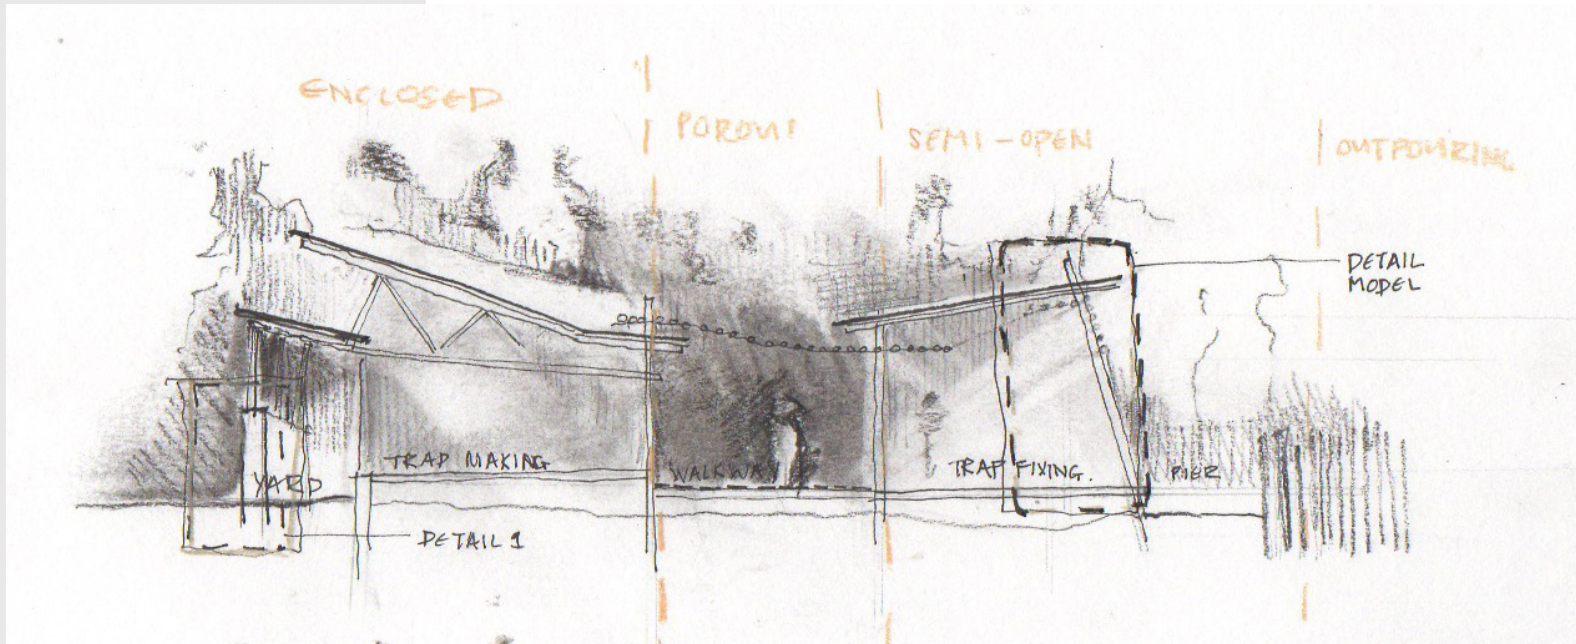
ROOF DETAIL (AUTHOR, 2023)
